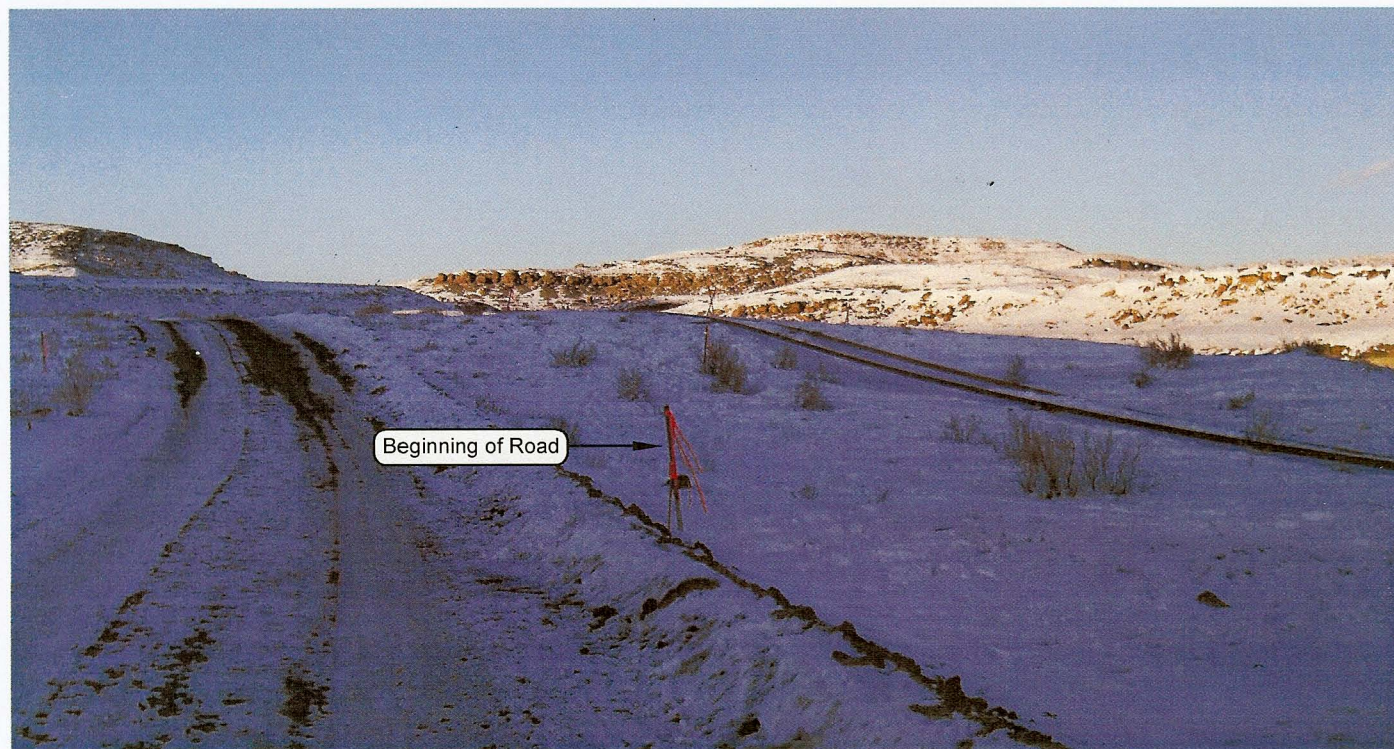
PHOTO VIEW: FROM BEGINNING OF PROPOSED ROAD
